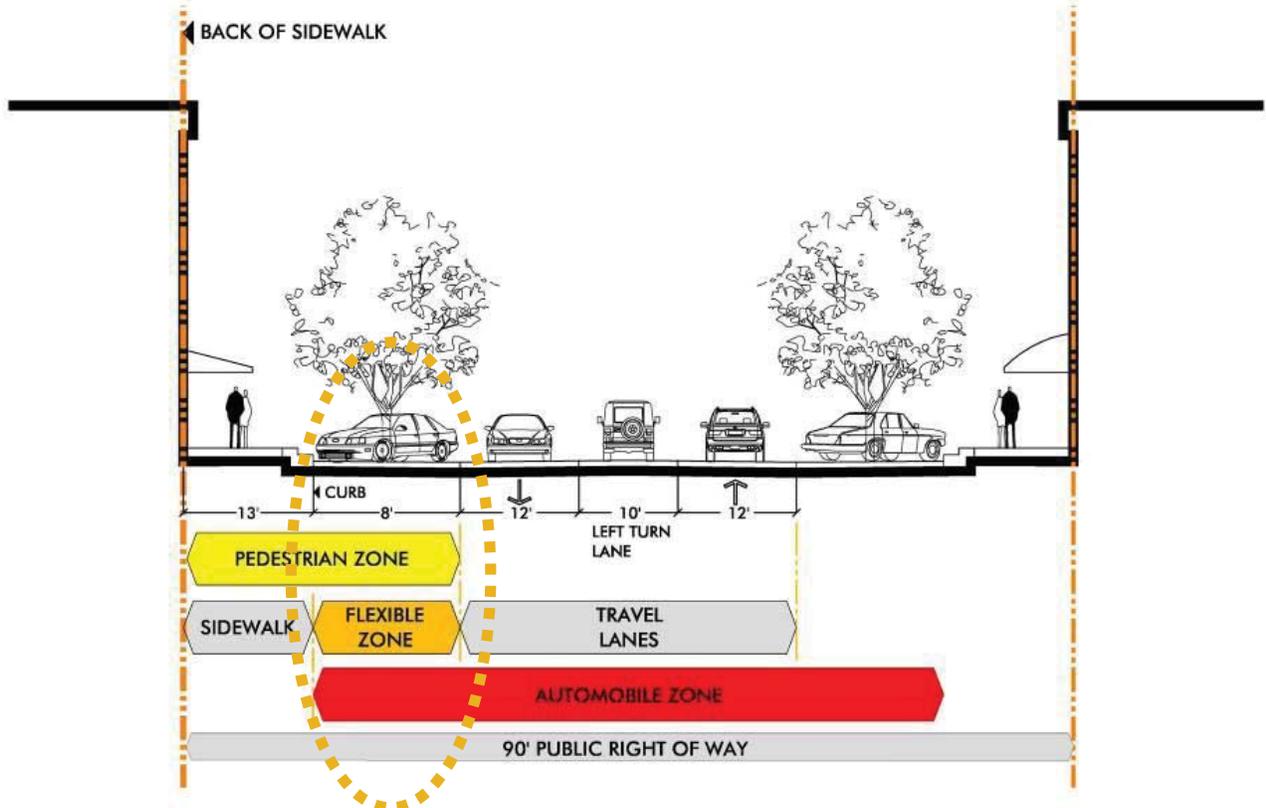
FIRST STREET - DESIGN CONCEPT
